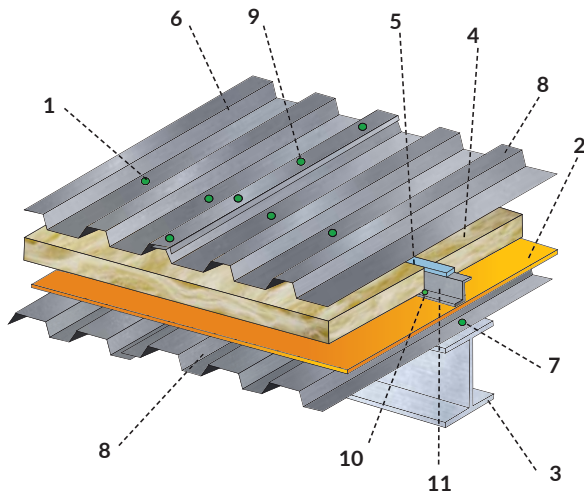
shows the recommended spacing of farmer screws. Roof sheet is fixed to the structure by farmer screws 4,8 * 35 in the lowest point of the wave (fig. 2). Roof sheets sections on lengthwise overlaps must be connected with 4,8 * 20 screws at the highest point of the wave, just before the cross-embossing of the sheet.
